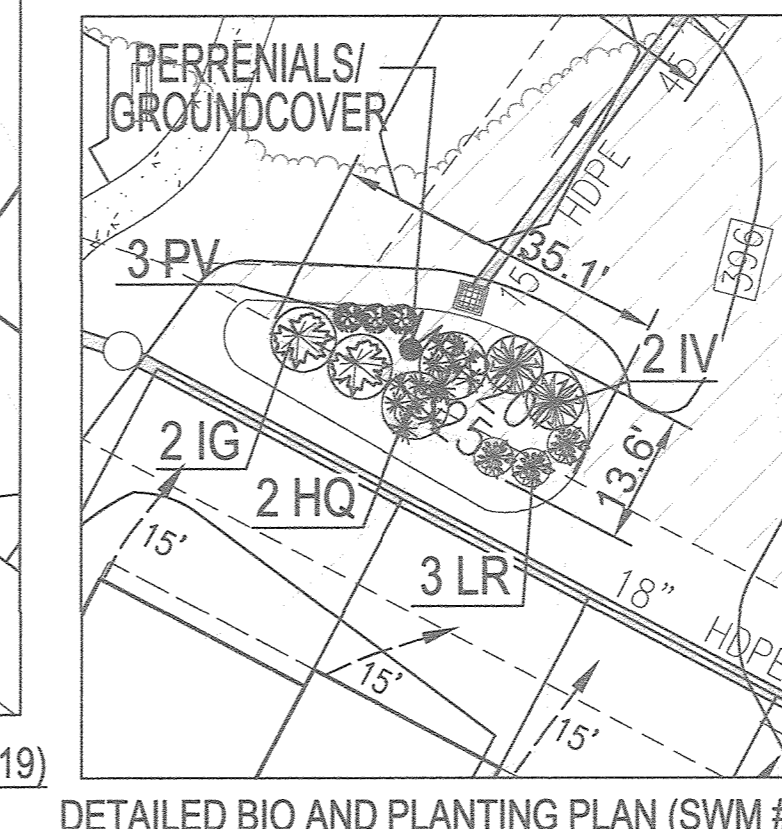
DETAILED BIO AND PLANTING PLAN (SWM #17)
